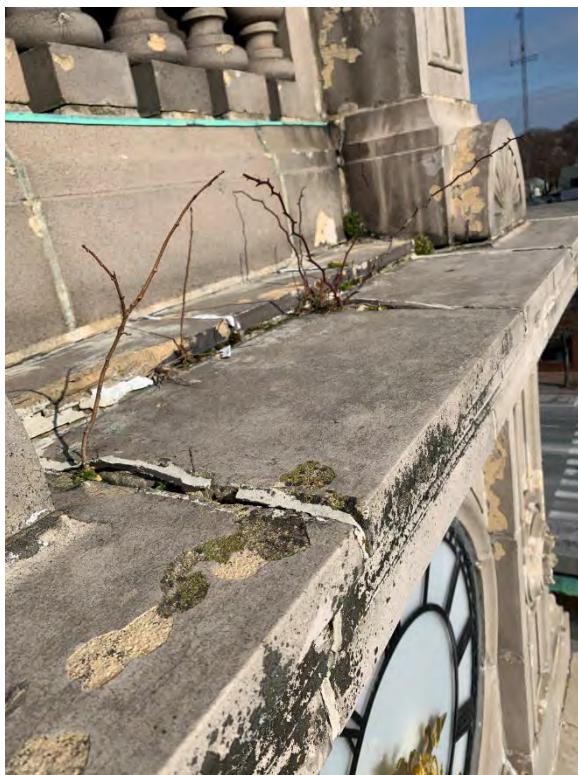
Failed caulking at joints, plant colonies, failed glazing and cracking
